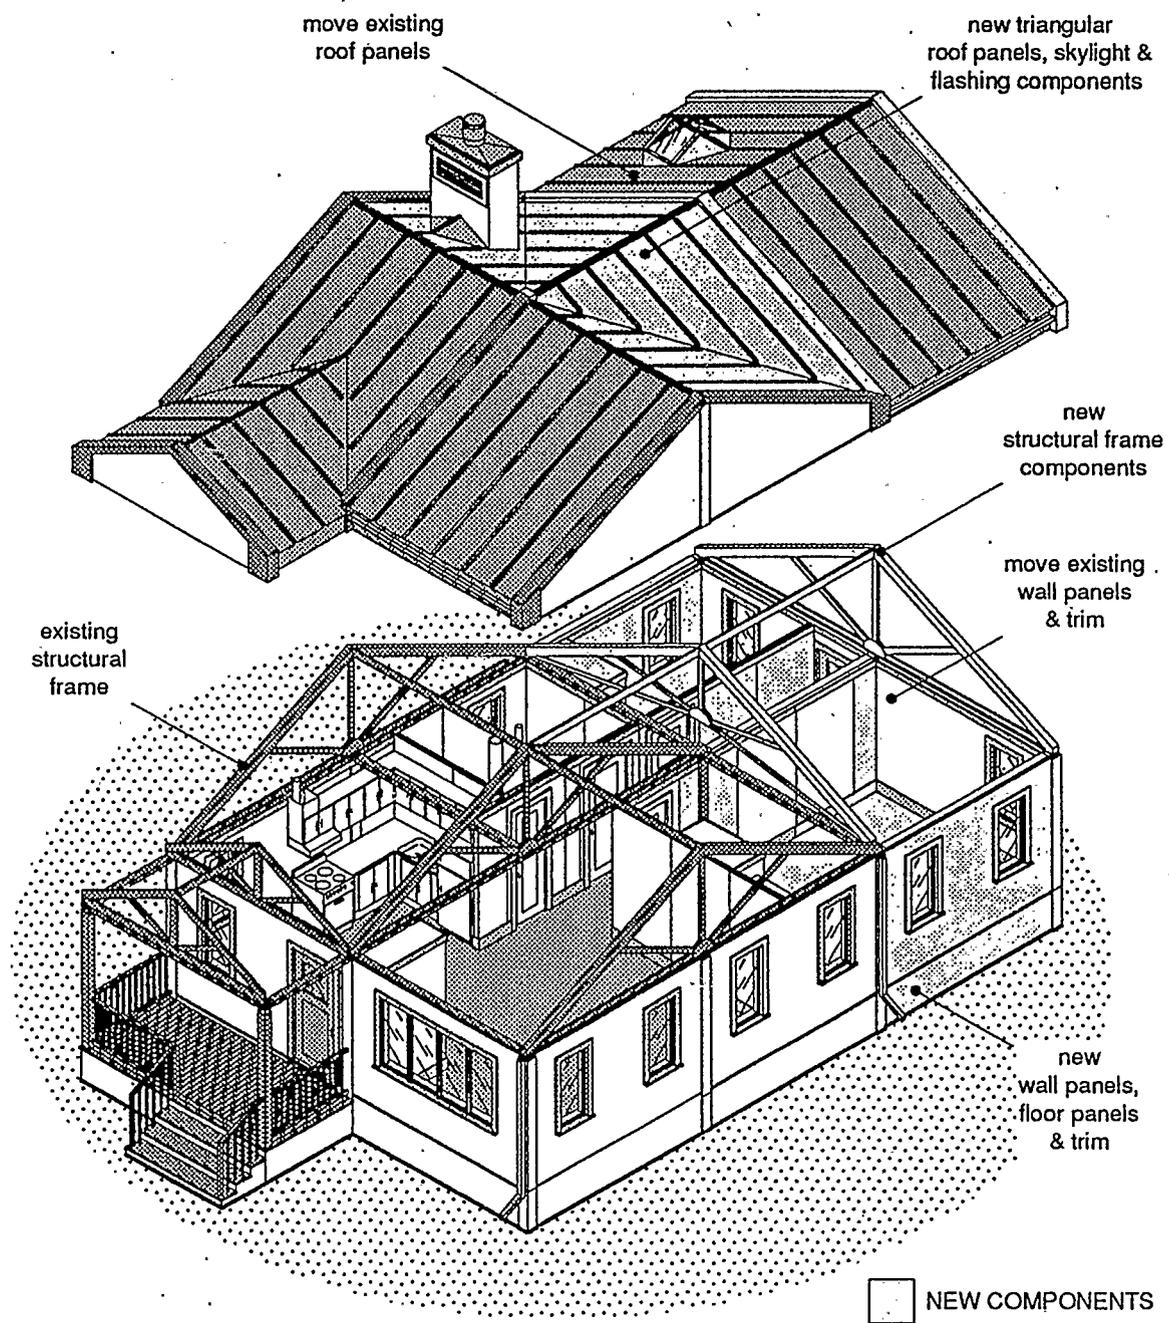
Addition of two volumetric modules to *Core House A
